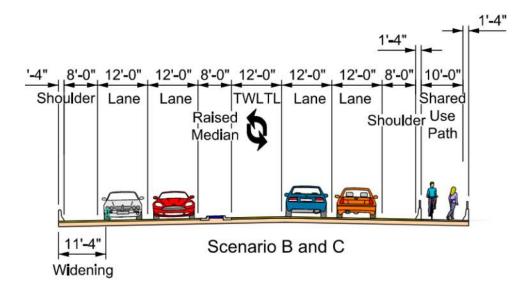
US14 Bypass/Structure # 06-169-150 Typical Sections
